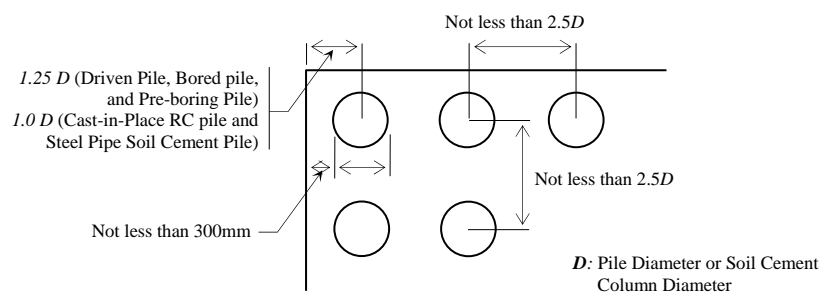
Minimum Distance between Pile Centers and Distance between Outermost Pile Center and Footing Edge
